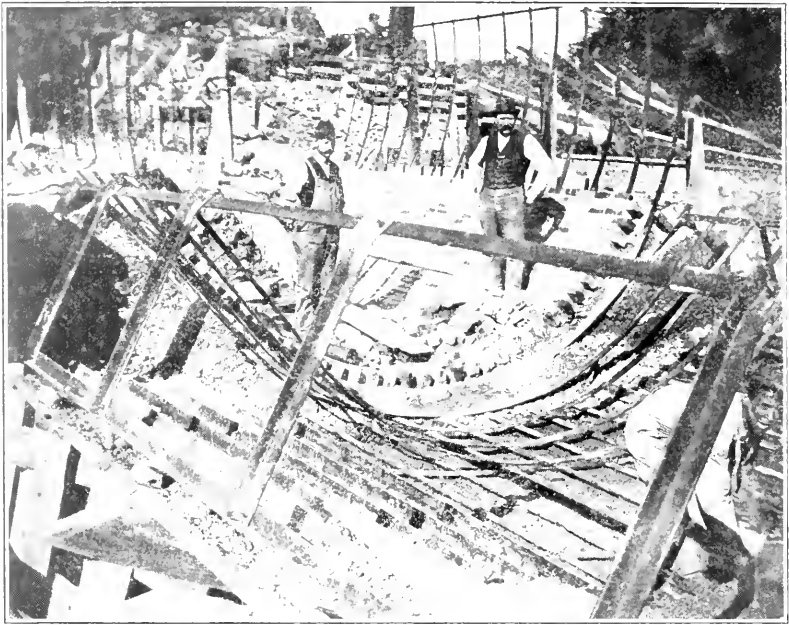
SHOWING TUBULAR BRIDGE CONSTRUCTION OF 13' 6" SEWER AT NINE-MILE CREEK CROSSING.
